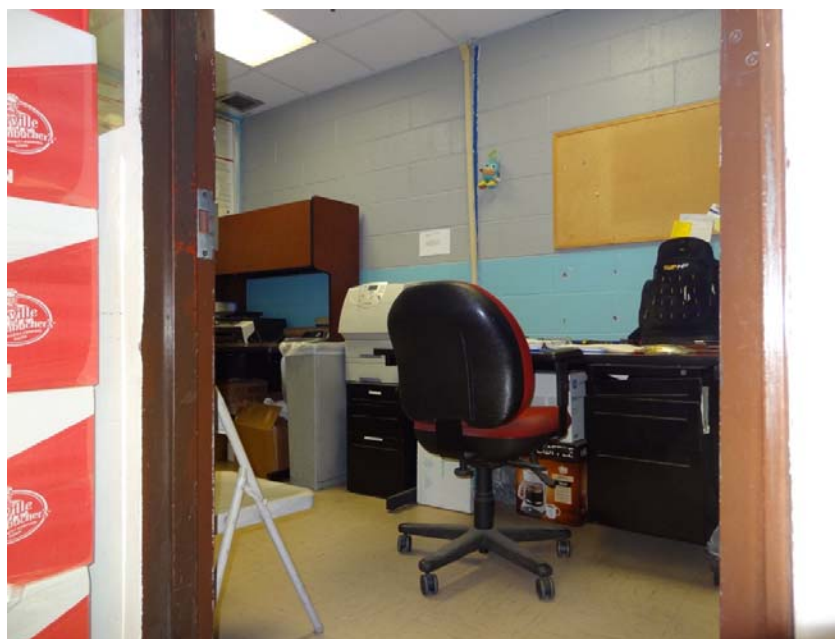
General view of ACM floor tile in the former receiving office in the Commissary warehouse area.
